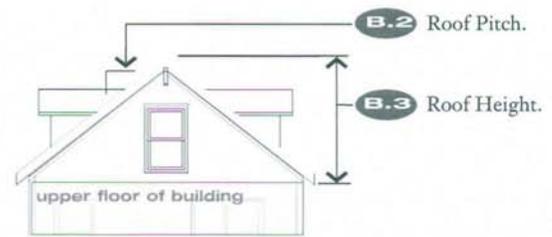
Figure VI-B. Pitched Roof Cap Type (Gable Roof).
